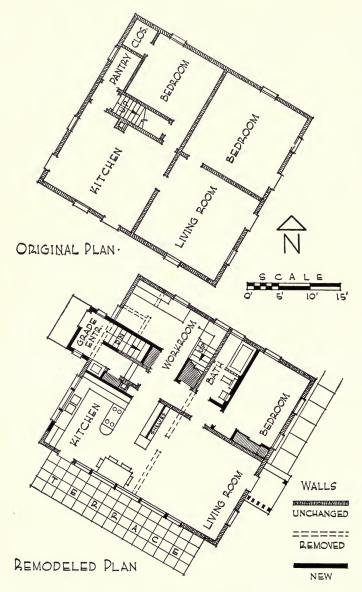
Before and after remodeling of first floor of an old house to add modern features.
